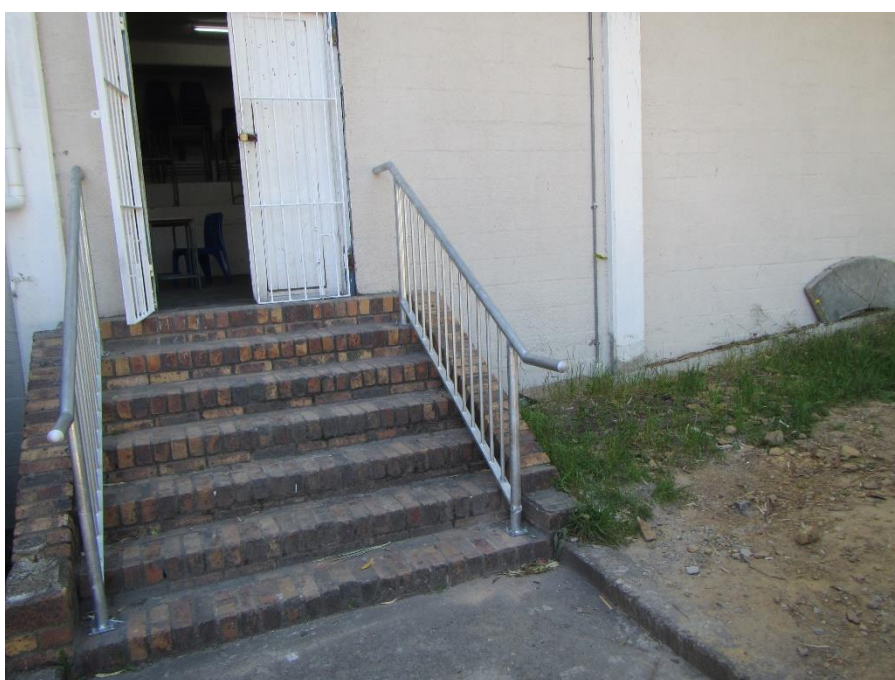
B after: (Staircase 3) addition of steel handrails and balustrades on external stairs and walkways.
